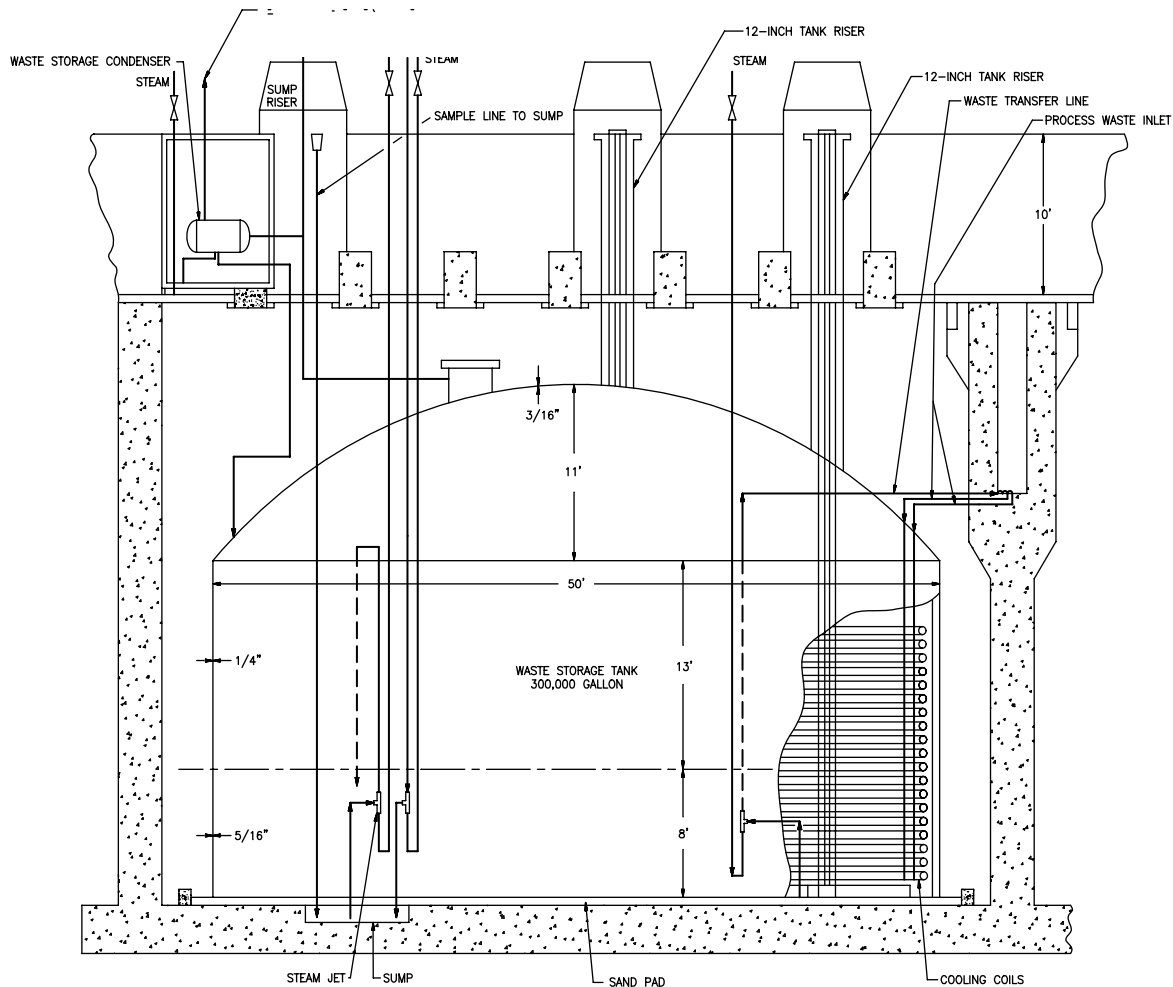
Cross-sectional view of a typical tank with cooling coils.^f
